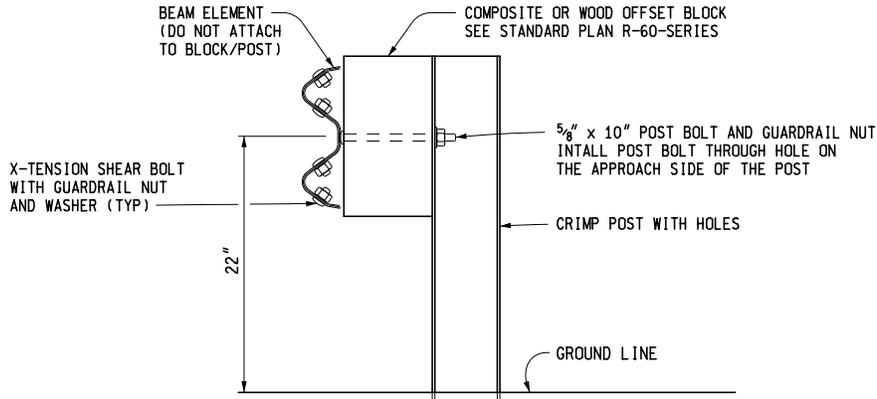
DETAILS ON THIS SHEET ONLY APPLY TO "X-LITE-FLARED".
